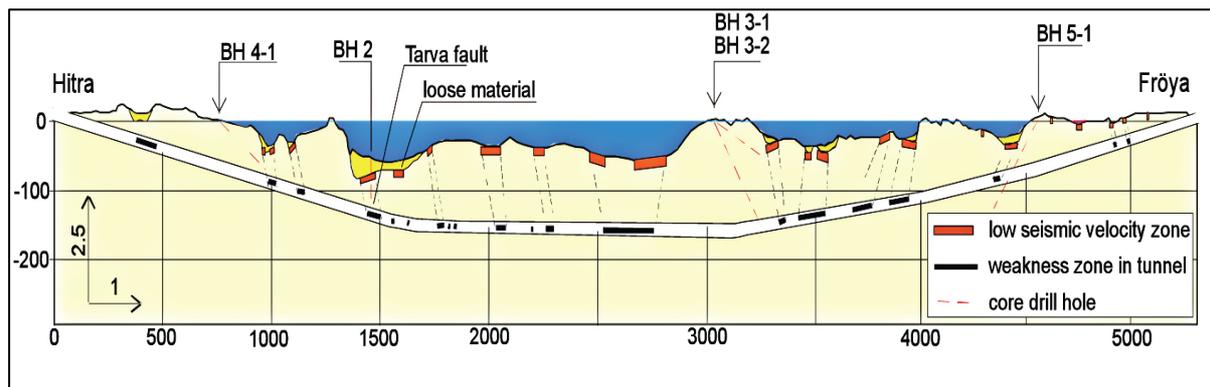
Longitudinal Section of the Frøya Tunnel Project (source: NFF (2009)).
